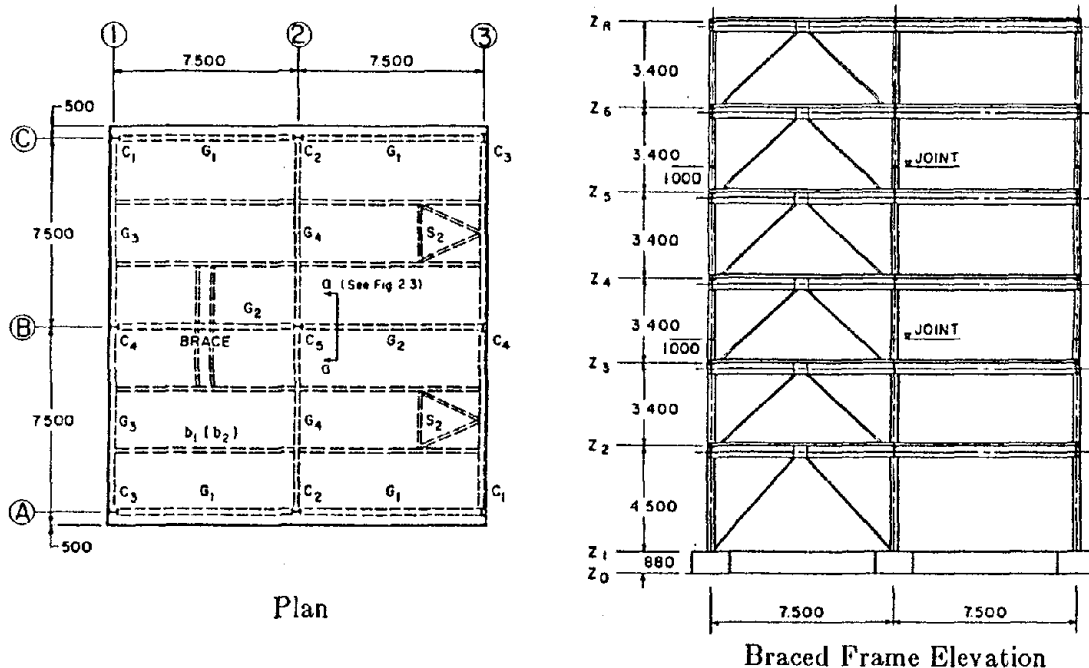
Full-Scale CBDS Plan and Elevation (mm)
